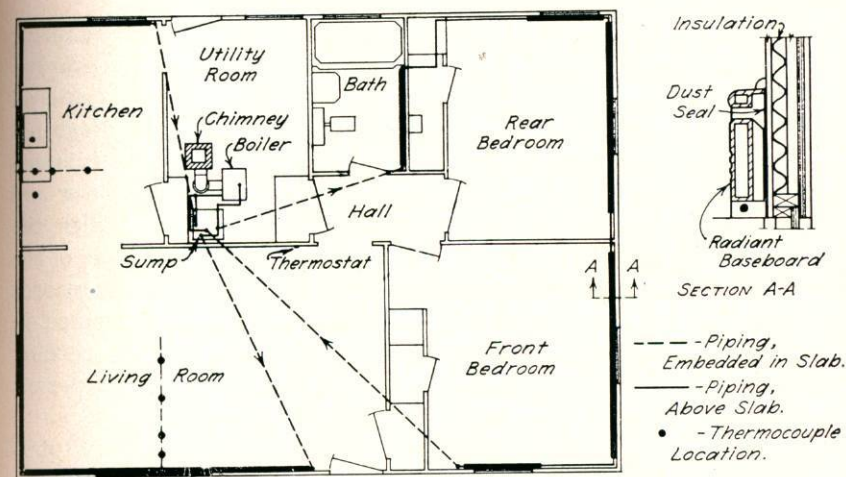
FLOOR PLAN SHOWING LOCATION OF BASEBOARD RADIATION
